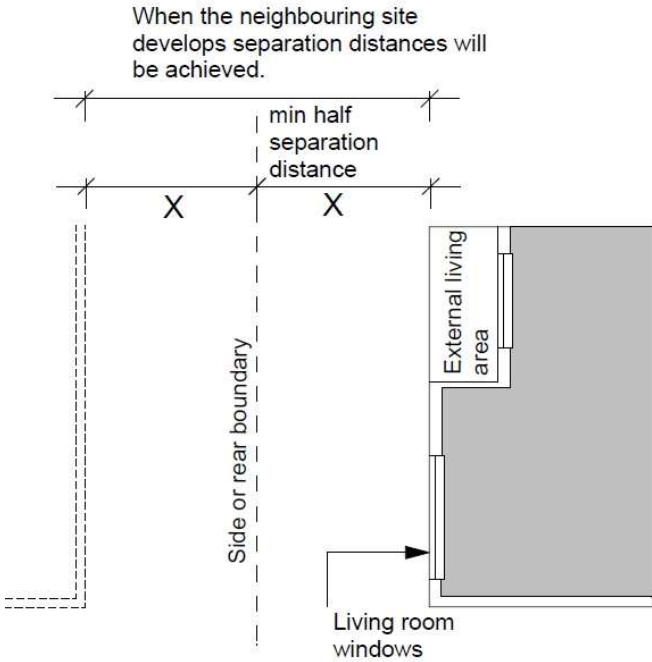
Plan - Side and rear boundary setbacks to prevent overlooking
